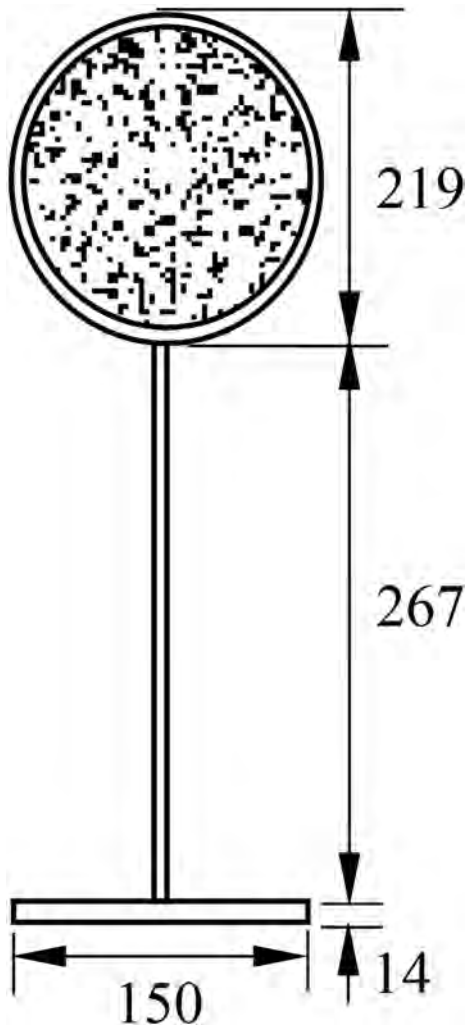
Cross-section of a composite beam with a concrete filled circular tubular flange (all units in mm).
